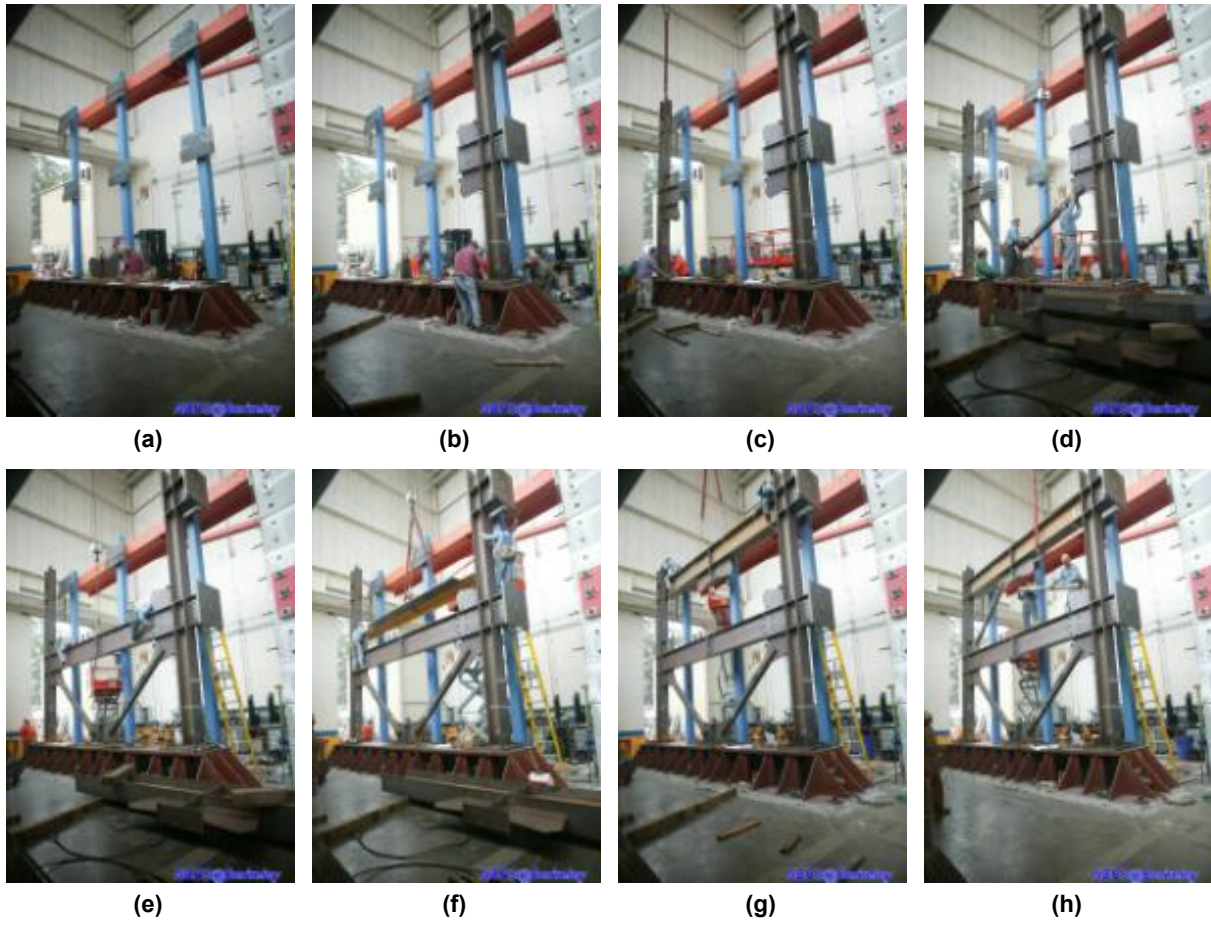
Specimen TCBF-B-1: key construction steps.
